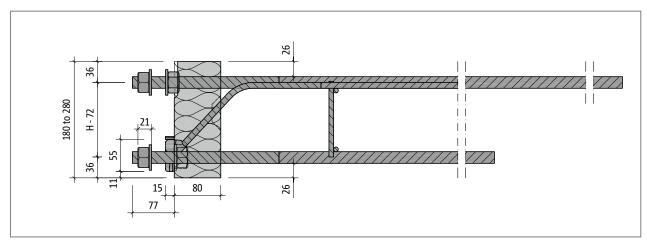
Schöck Isokorb® T type SK-MM2-VV1: Cross section of the product
